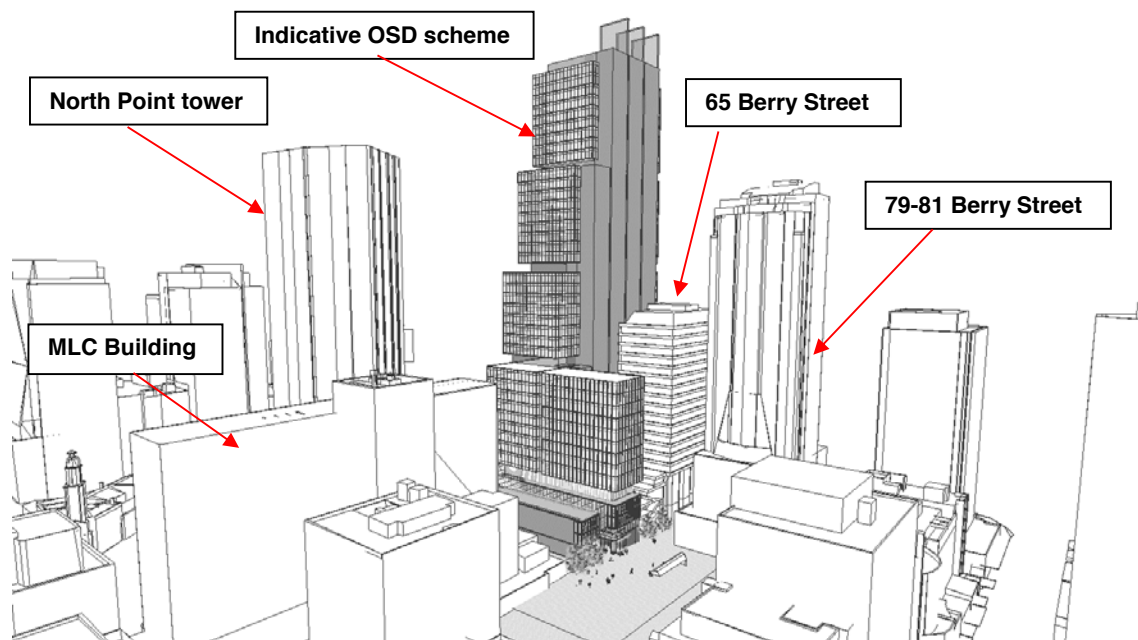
Sketch up view of the indicative scheme for the Victoria Cross OSD looking up Denison Street from the south-east. The MLC Building, North Point tower and medium-high-rise buildings on the corner of Denison and Berry Streets are indicated by the red arrows.
